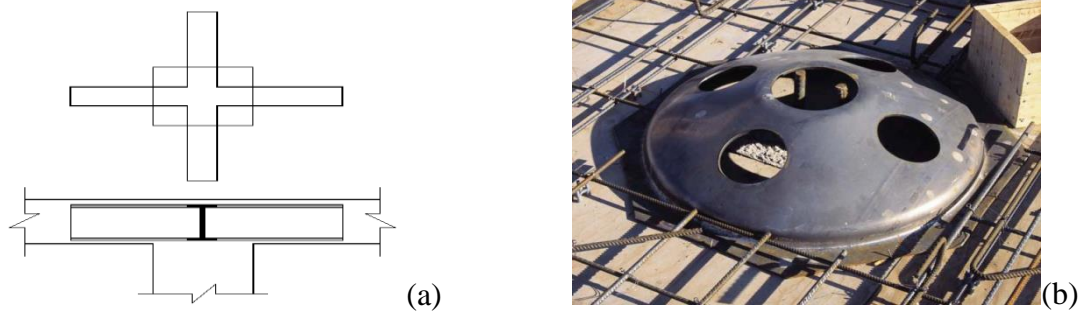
Types of shear reinforcement, a) Shearhead (I section) reinforcement.
